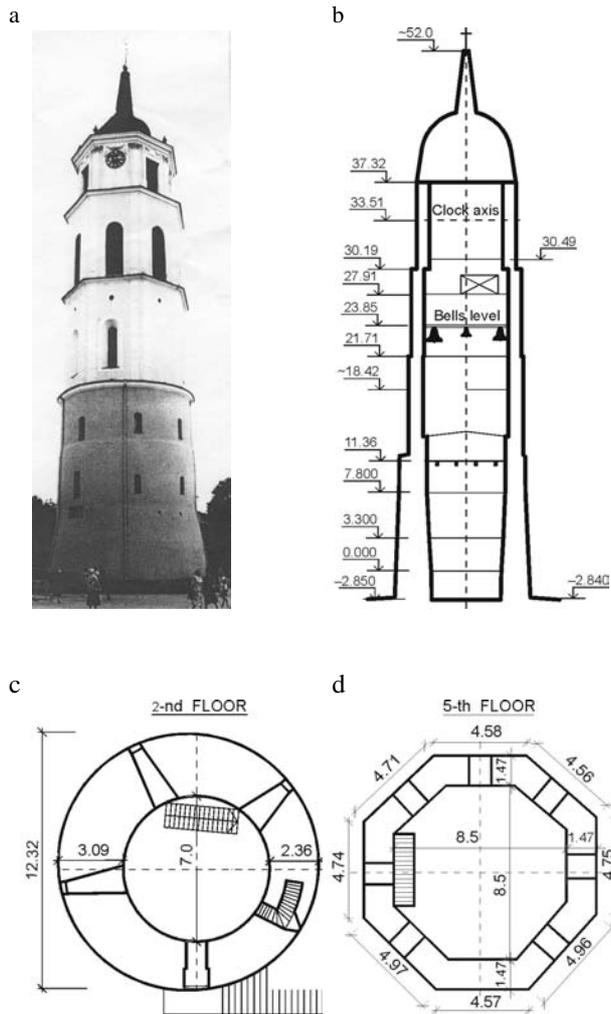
The Belfry's geometry: a – a general view; b – vertical cross section; c – horizontal cross section of the lower part; d – horizontal cross section of the upper part
